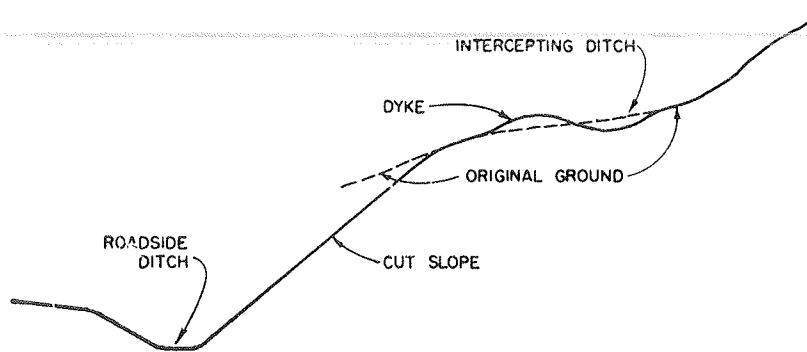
Cut slopes may be protected from surface water from above by constructing intercepting ditches as shown here. The ditch must run full length of the slope and have a safe outlet.
